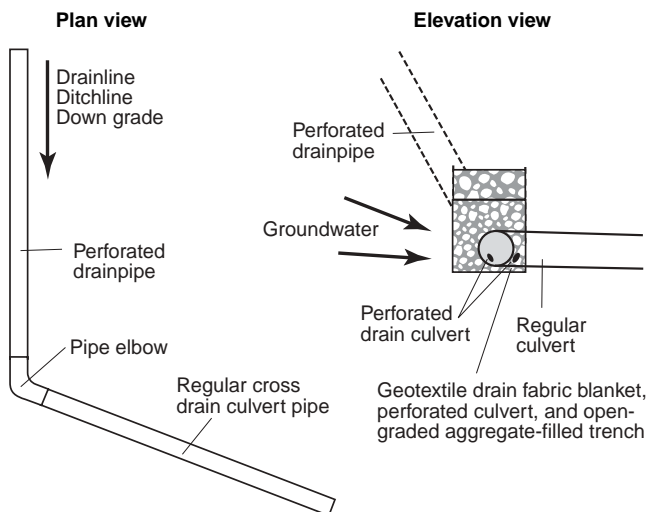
Under-drain used to cut off groundwater before it seeps into the subgrade.
